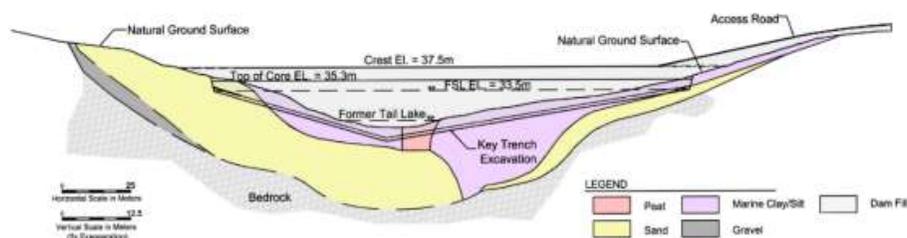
Longitudinal section of the North Dam showing generalized foundation conditions.
